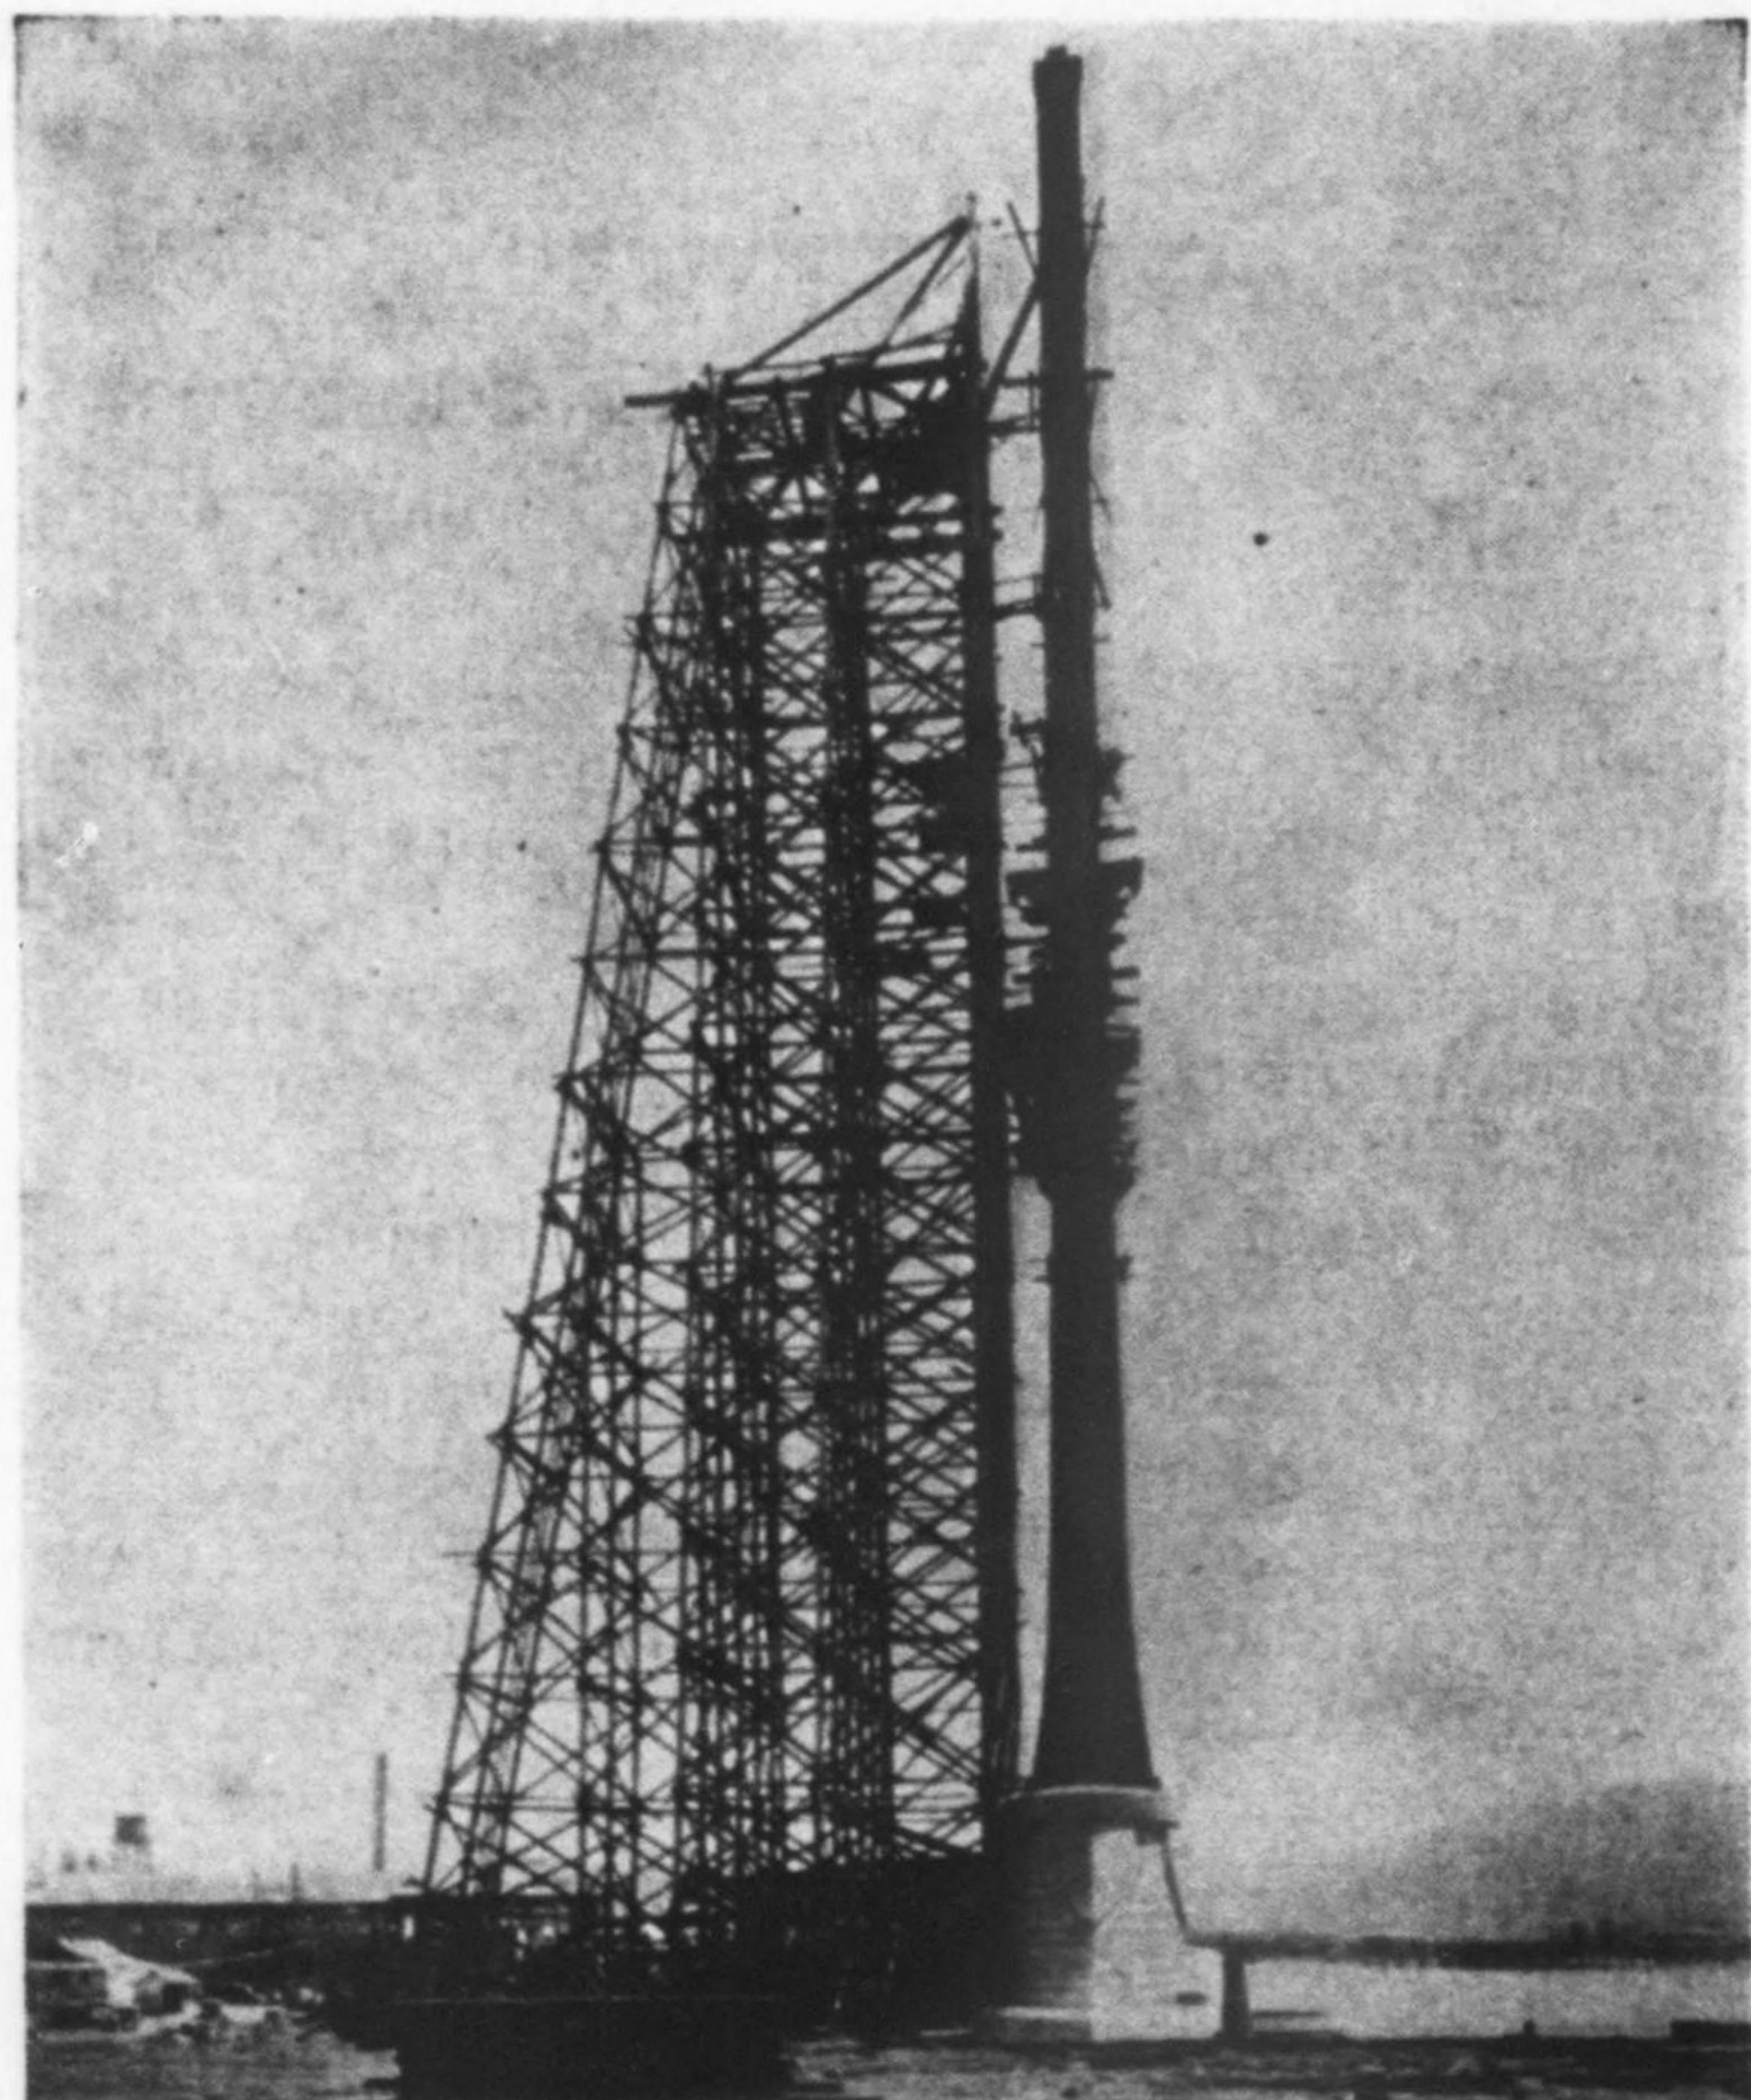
TIMBER FALSEWORK USED TO ERECT STEEL TOWERS OF ST. JOHNS SUSPENSION BRIDGE
